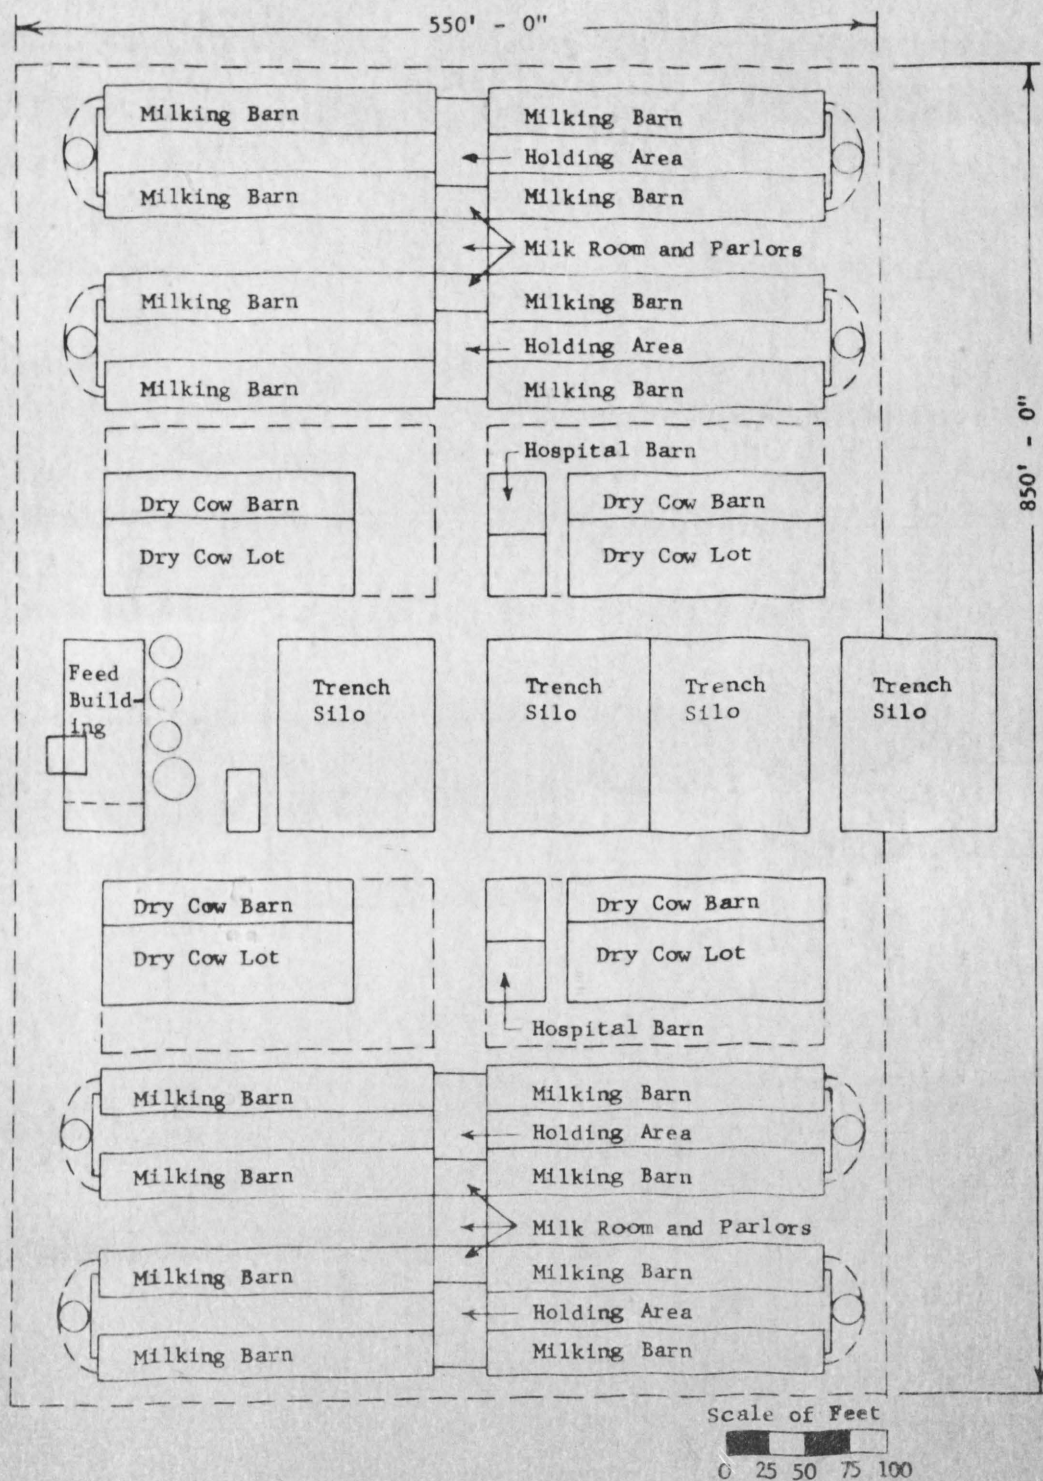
Figure IV. Proposed Layout For 1,920 Cow Dairy Herd - Stanchion Barns
